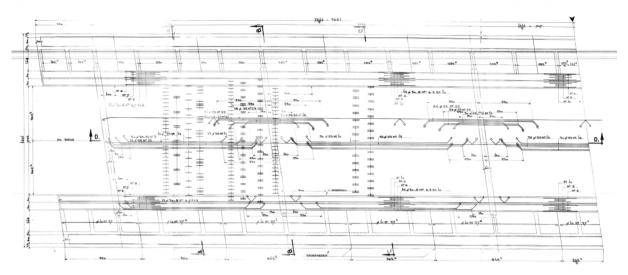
Top view of longitudinal reinforcement for spans 1, 2, and half of span 3. Dimensions in cm, except for bar diameters in mm.
